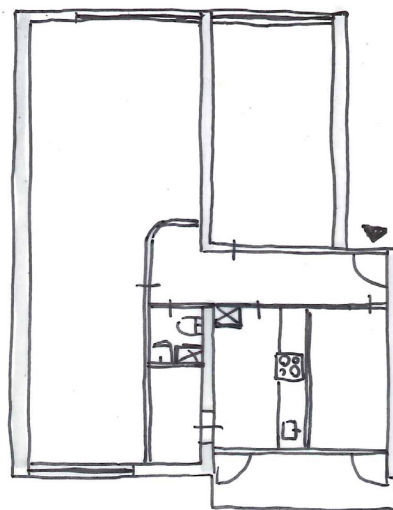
Plan of one of the portico homes in Hof van Delft, with concrete walls and brick masonry façades (own ill.).
